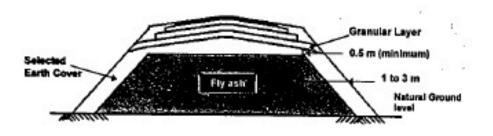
Typical Cross-Section of Embankment with Core of Fly Ash
